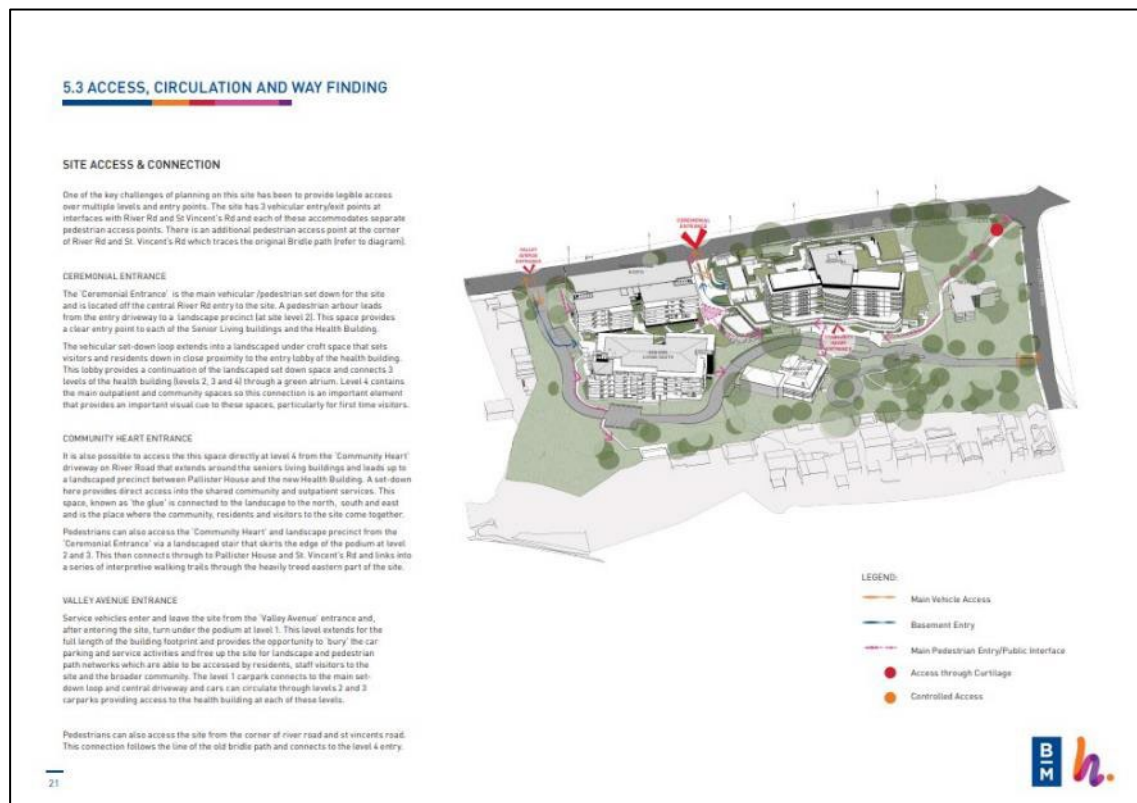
Design Report extract showing access of site and proximity of buildings to Pallister House
